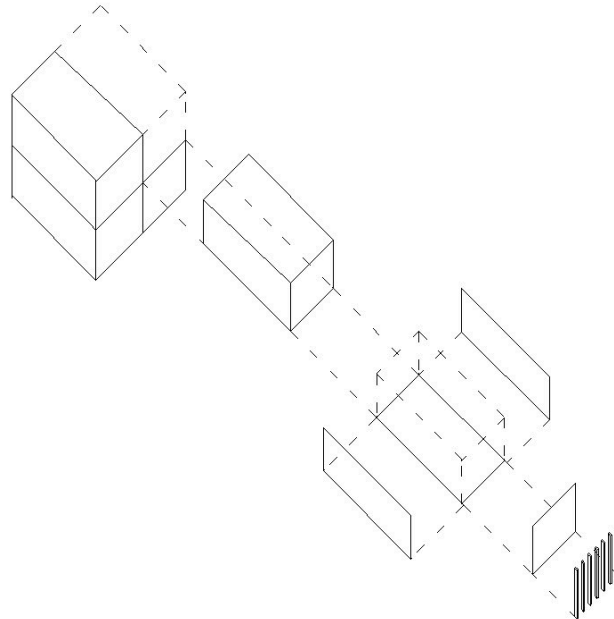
Different levels of Timber construction (top: timber frame, middle: panel system, bottom: volumetric system) (Walsh & Sandin, 2020)
